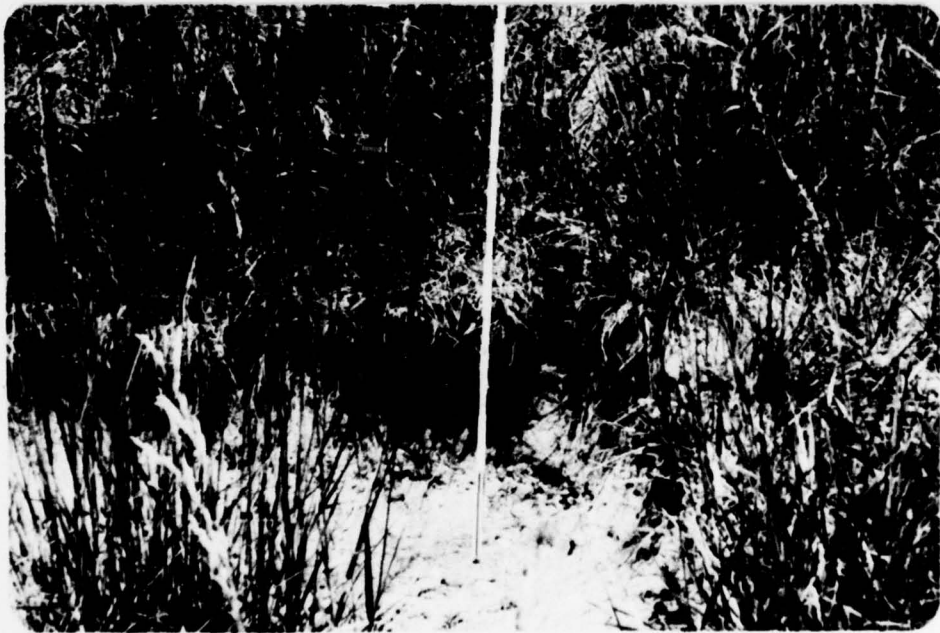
EROSION DOWNSTREAM SLOPE
